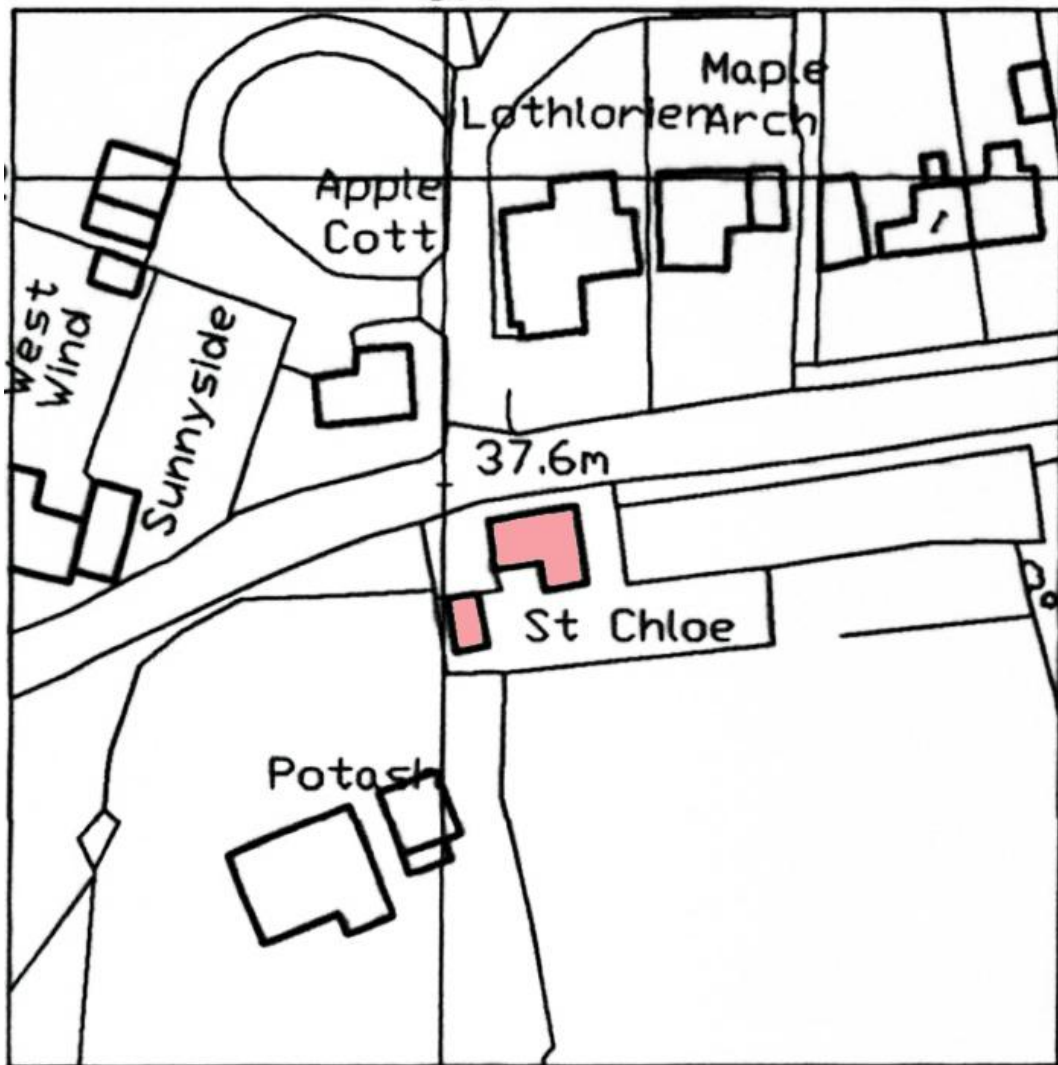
The existing site plan submitted with the current application highlighting the house and its detached rear garage in red.
